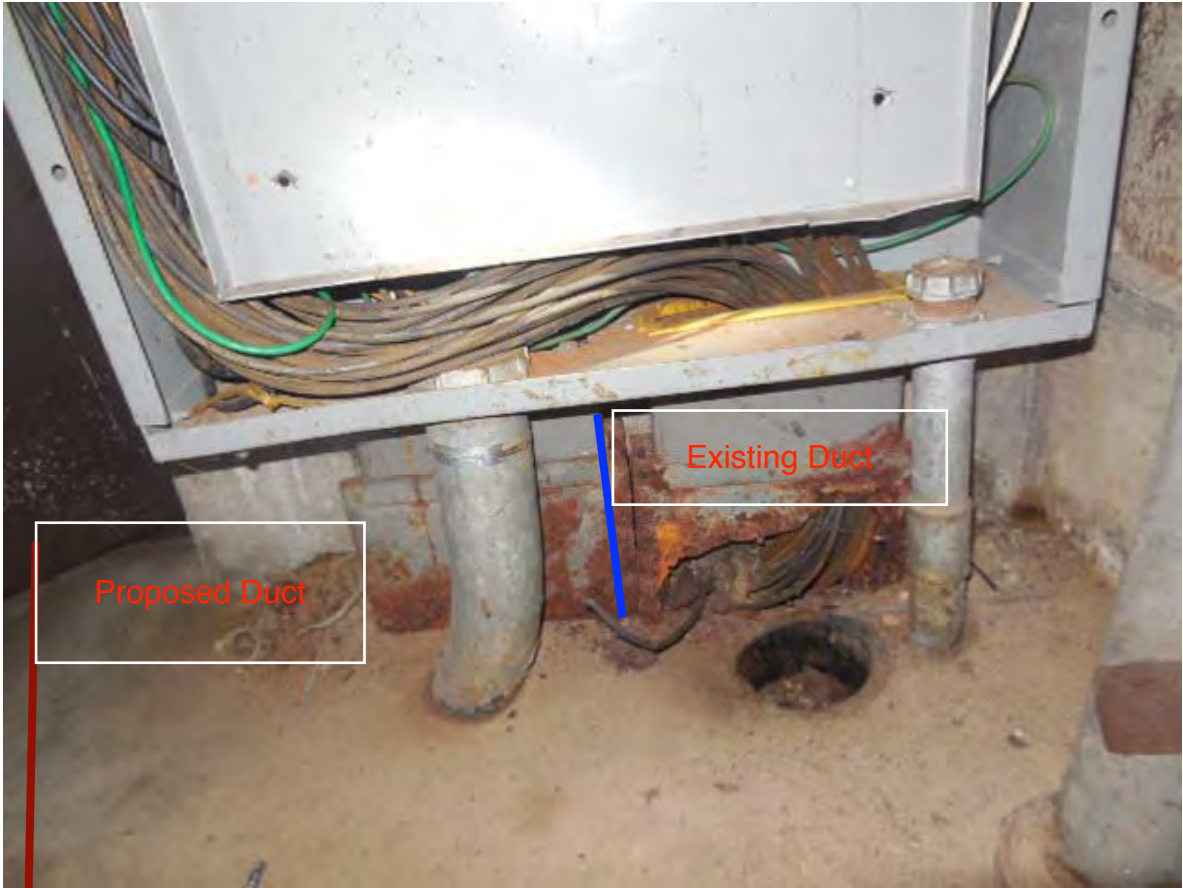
Handhole adjacent to fare vending machines on mezzanine floor
